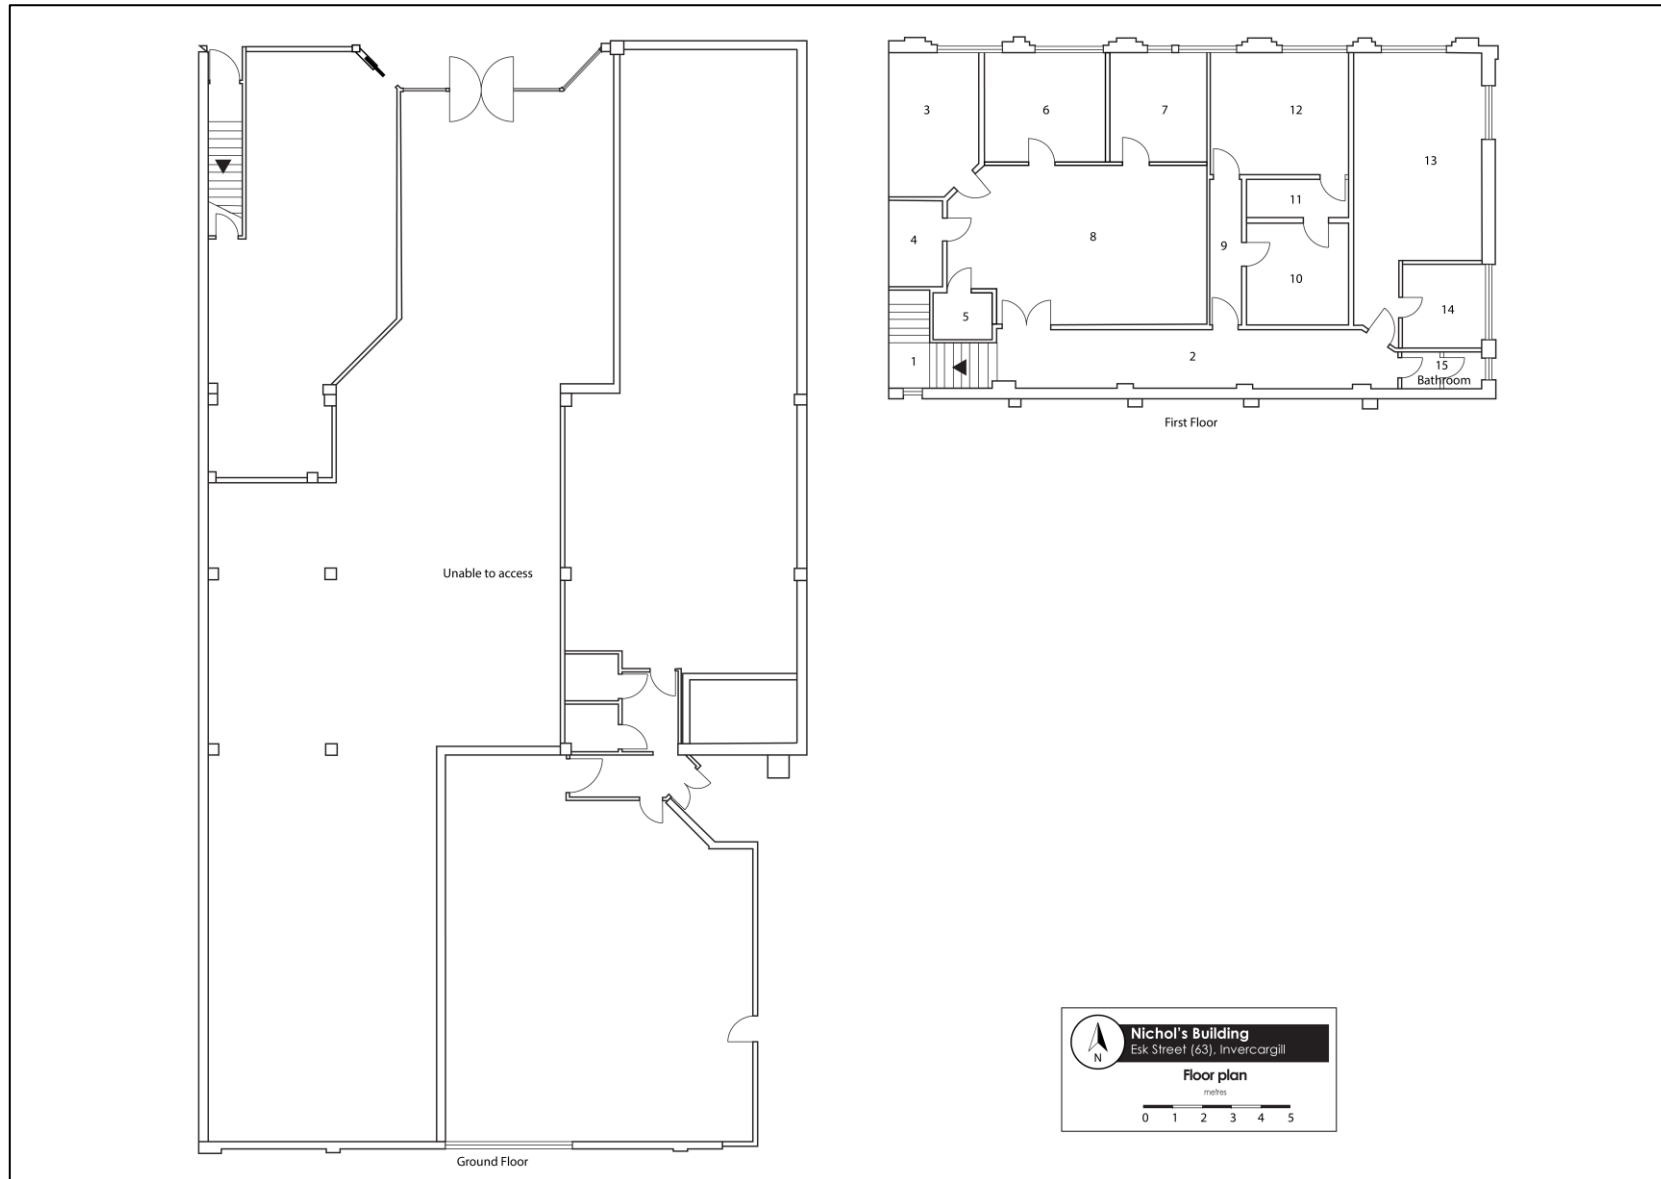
Ground (left) and first (right) floor plans of Nichol's Building.
